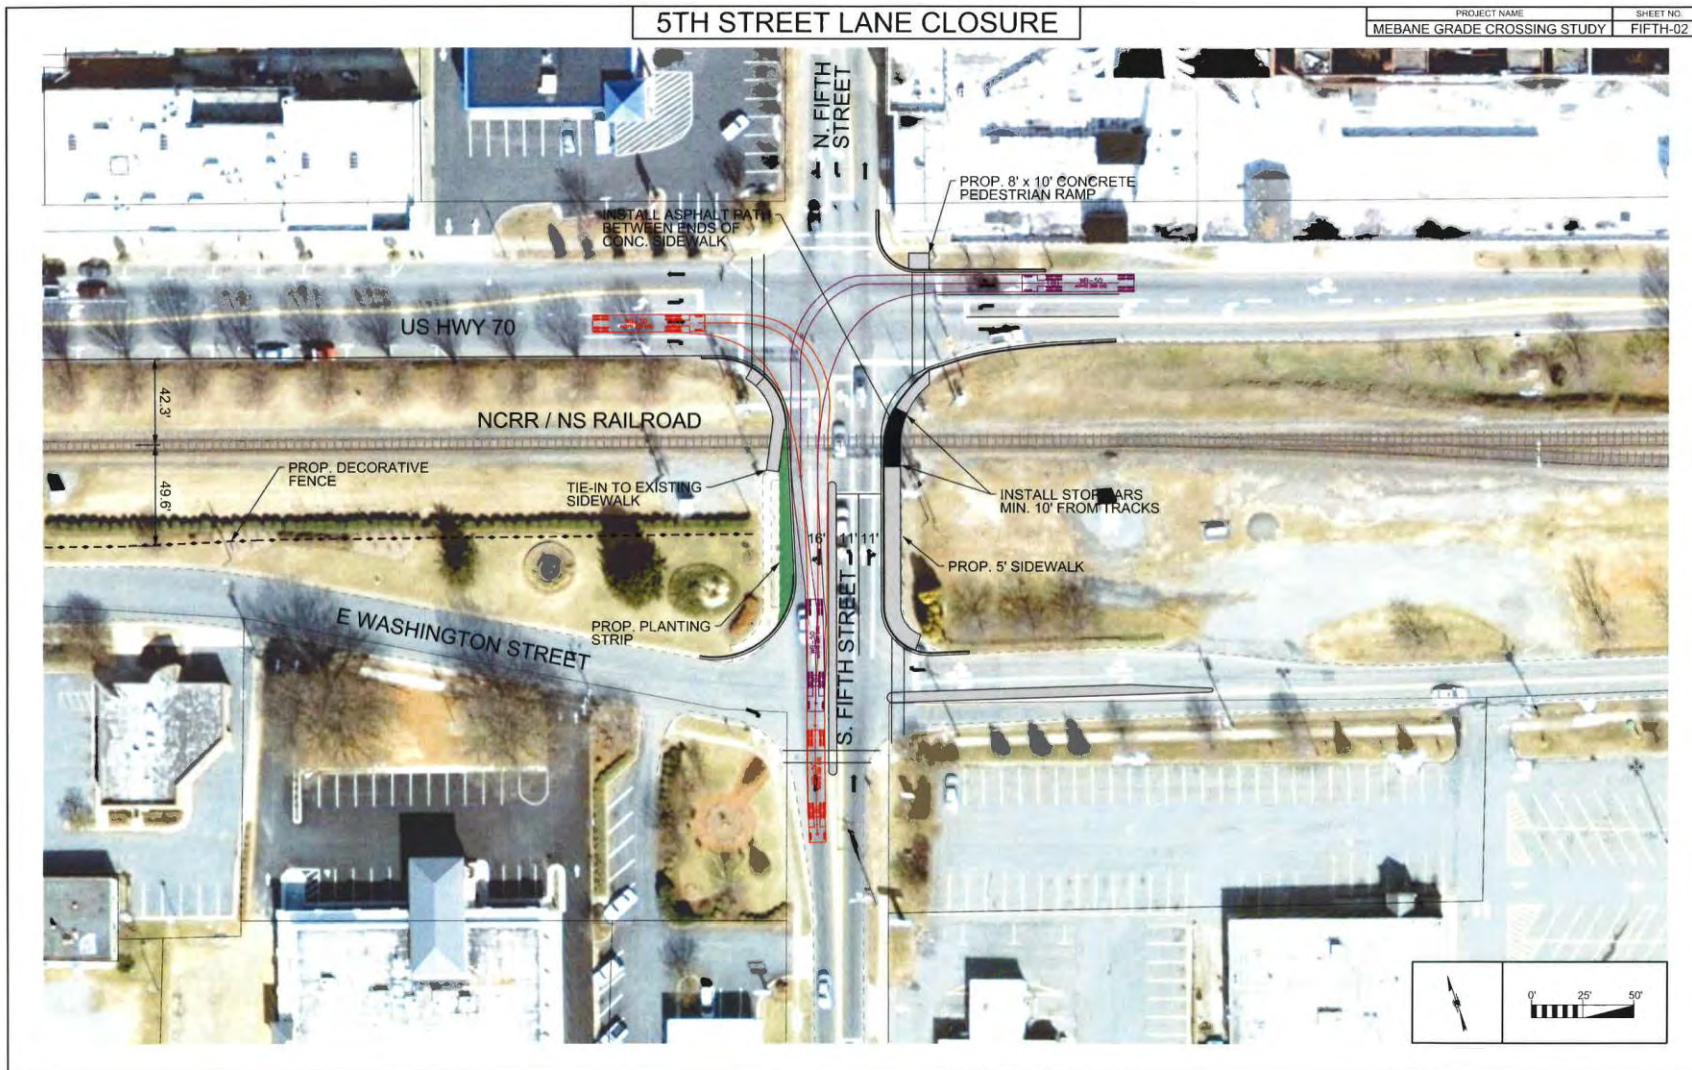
5th Street (Crossing # 735 472D) – Exhibit depicting if sidewalks could be installed on the western side of 5th Street, which would require eliminating one of the two southbound travel lanes on Fifth Street.
